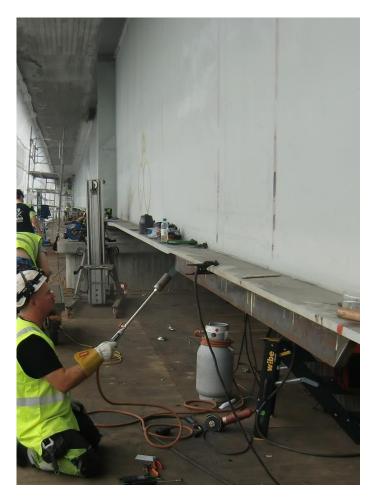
Pre-heating of a longitudinal stiffener before welding. The outer end (near camera) later to be HFMItreated at the weld toe around the end section (2dm on each side plus at the corner).
